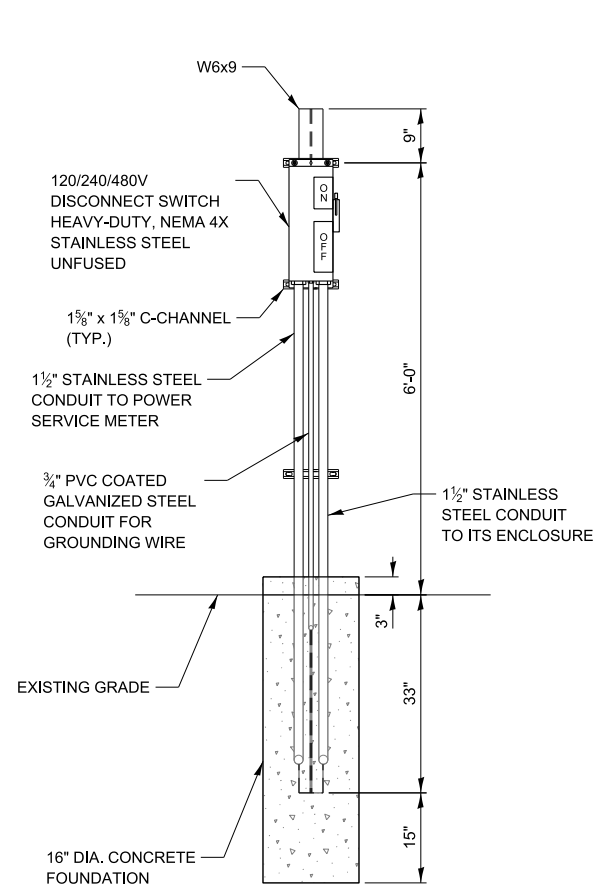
DETAIL A - TYPICAL MOUNTING ATTACHMENT CONNECTION
